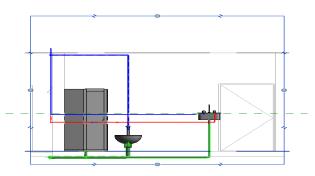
, Sectional elevation of common toilet. Safety management system for the building as per NBC Part (4)
